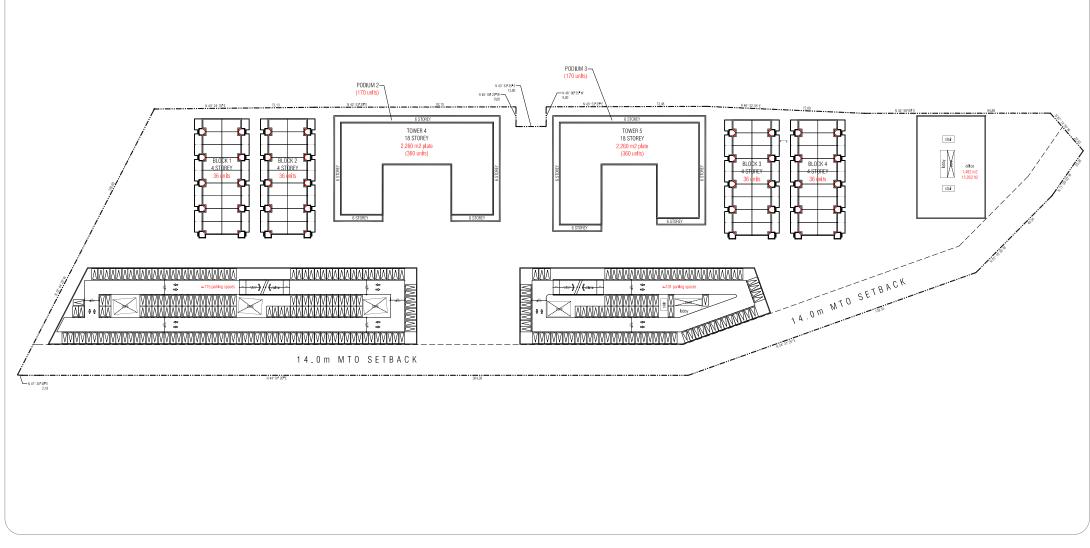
Ground Floor Plan: Prepared by Graziani & Corazza Architects
